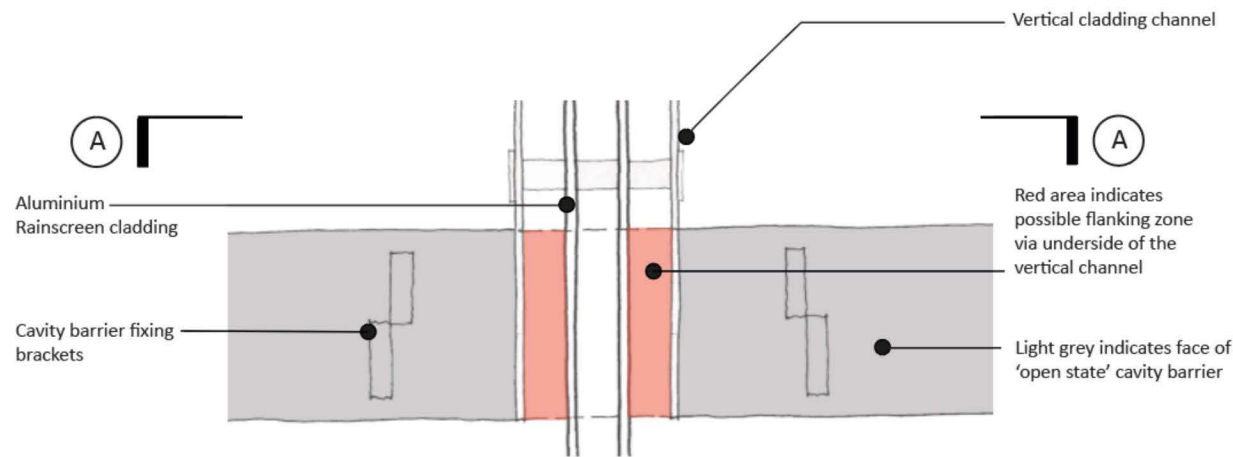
Sectional Elevation B-B Through Vertical Rail at Spandrel
